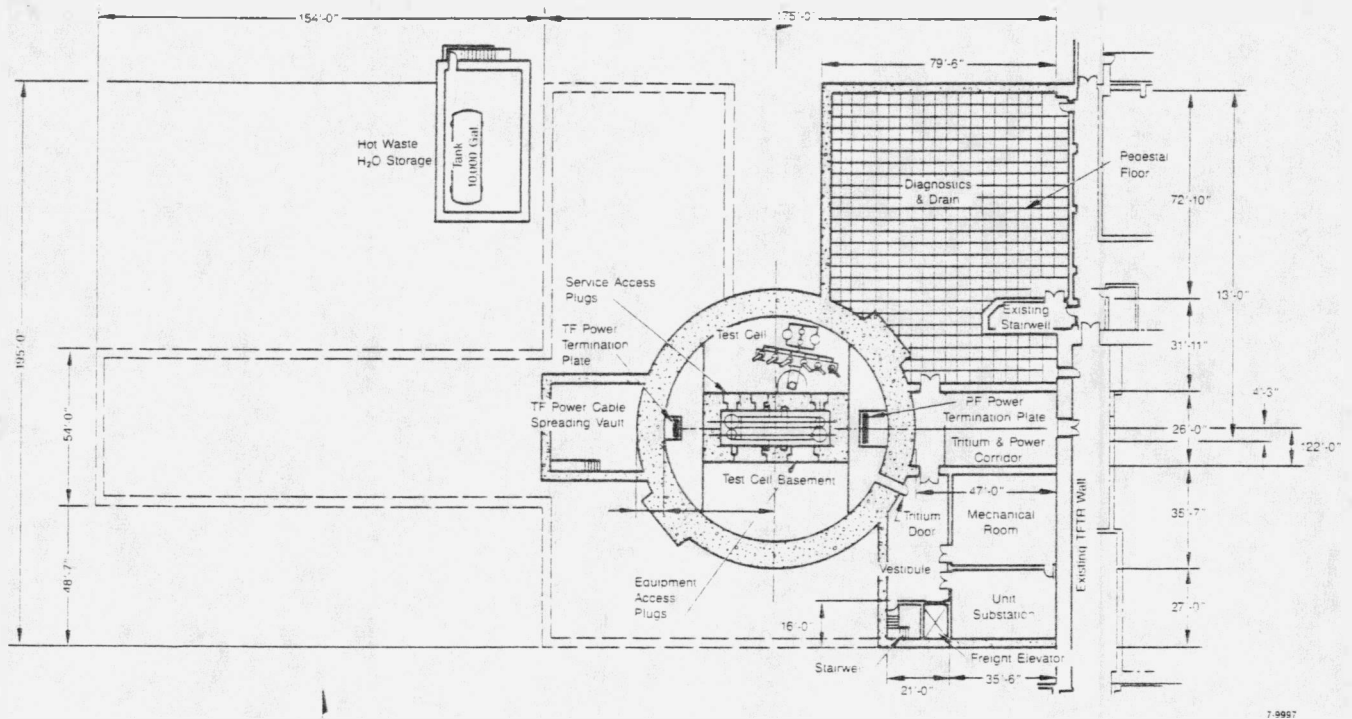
Basement floor plan of CIT conventional facilities baseline design.
